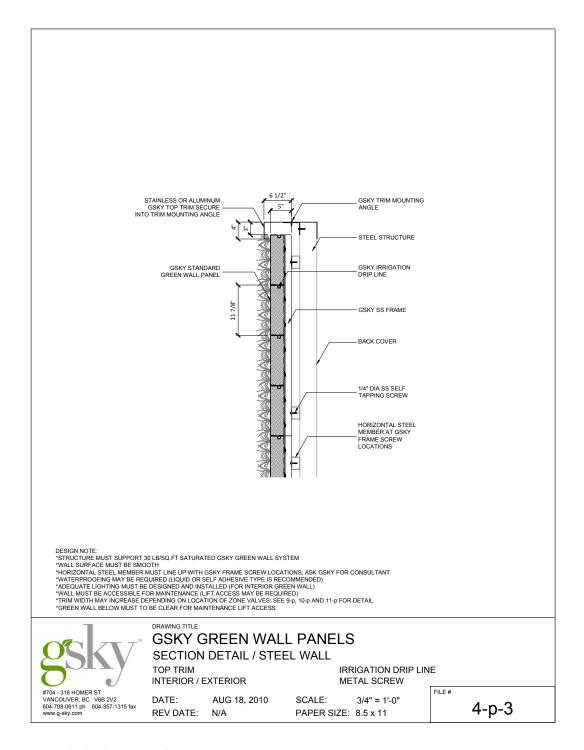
SECTION DETAIL/STEEL WALL http://gsky.com/green-walls/pro/cad-spec/
